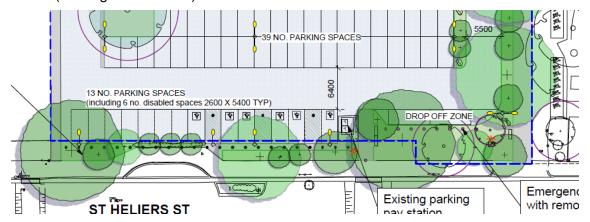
Extracted from Stage 2 – Proposed Works Plan showing 6 accessible spaces and 2 short terms pick up / drop off spaces.
